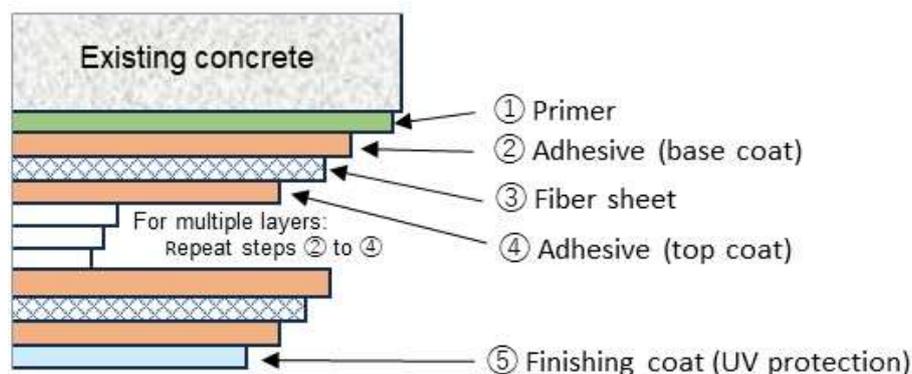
Example of Cross-Section of Continuous Fiber Sheet Bonding Method ²⁾
